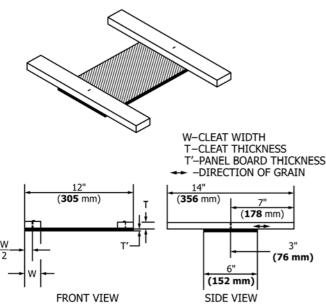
Test Specimen for Direct Withdrawal Resistance Test (Panel Assembly Test)
